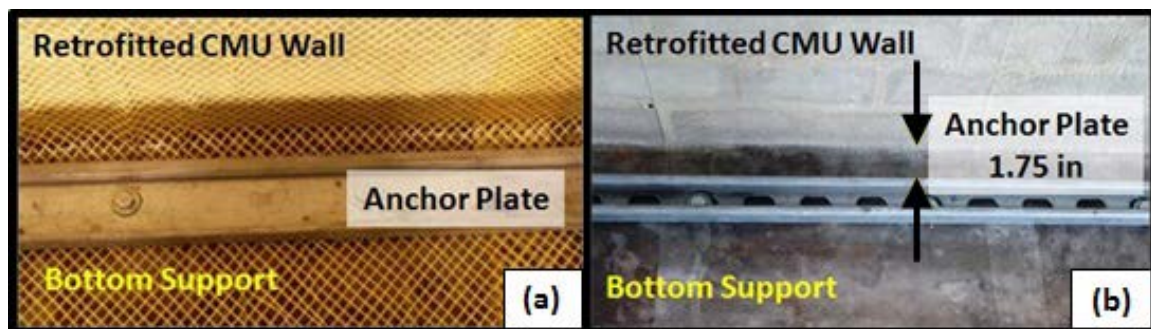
Anchorage. (a) System 3 – 3-in.-wide thin wall steel stud used as anchor plate. (b) System 4 – metal framing channel used as anchor plate.
